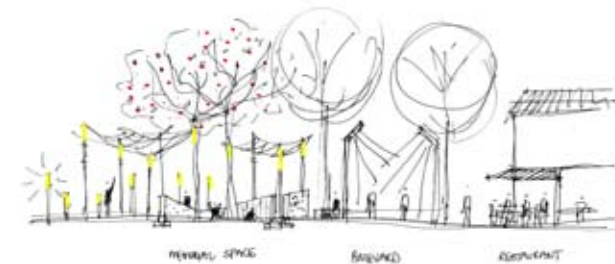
Conceptual Section C-C through Site (Author, 2009)
